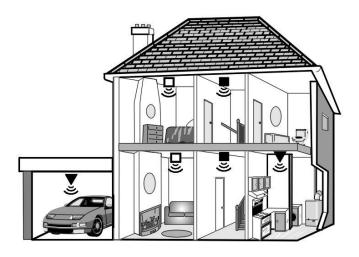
2 Multi Storey Dwelling with Recommended Locations
